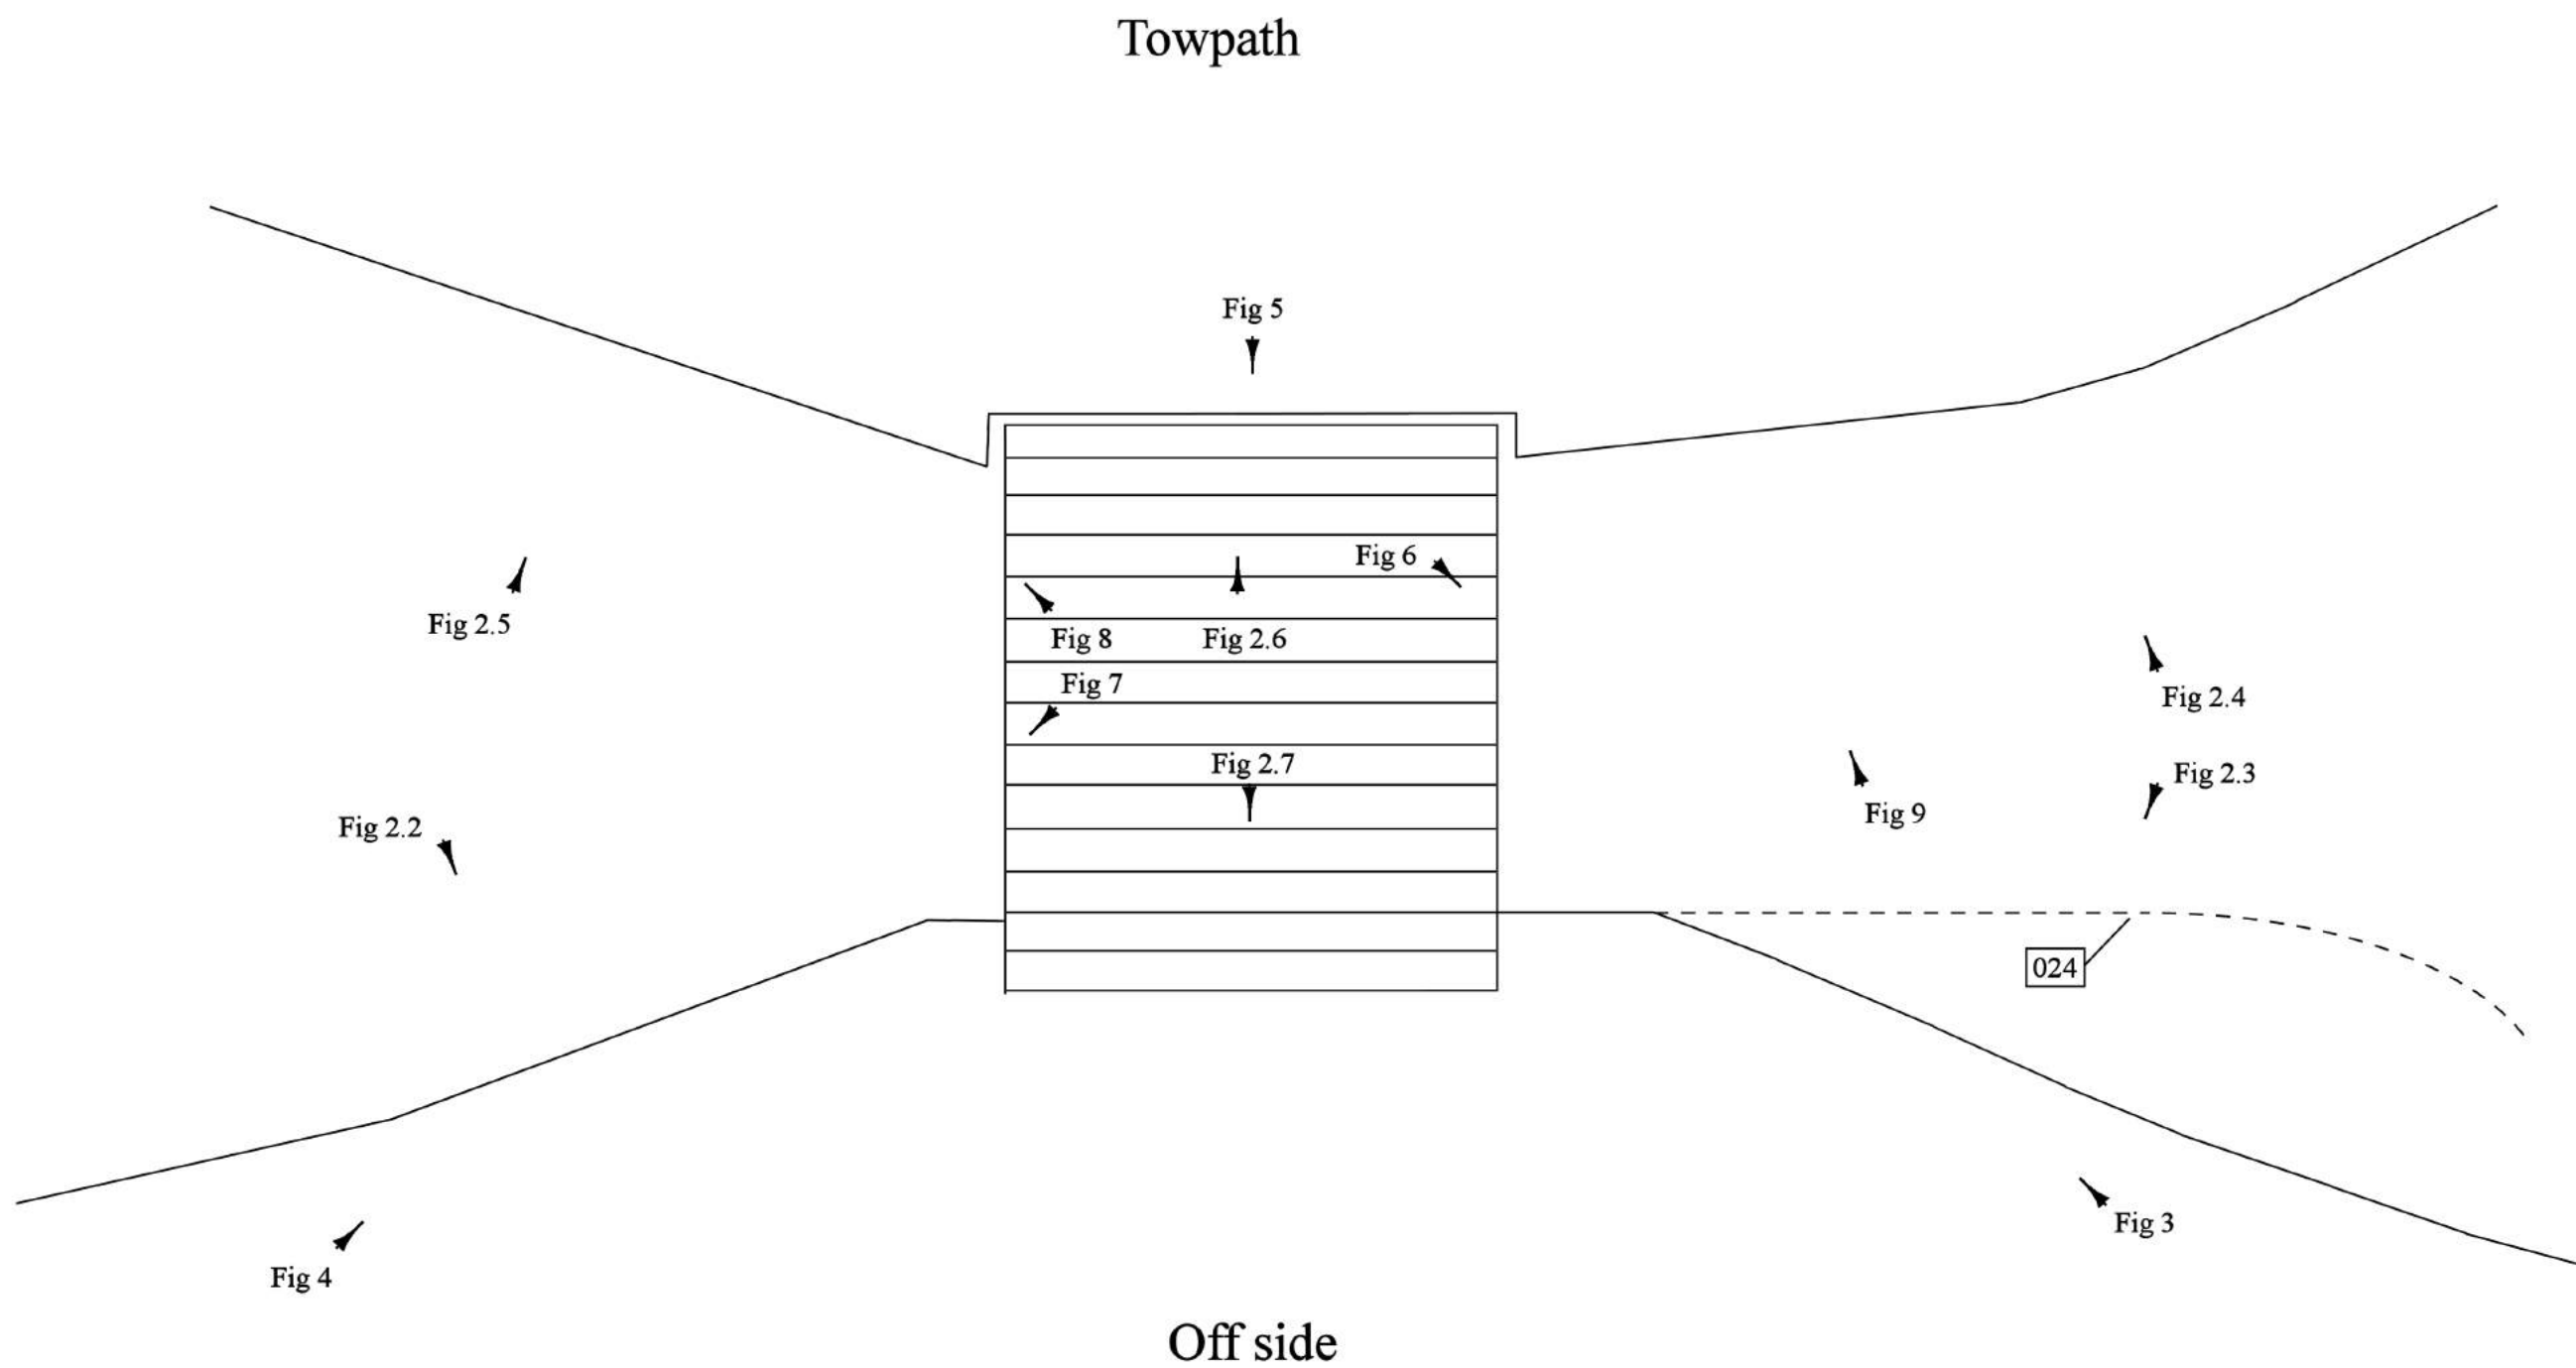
Plan of bridge showing deck, locations of elevations and other photographs
